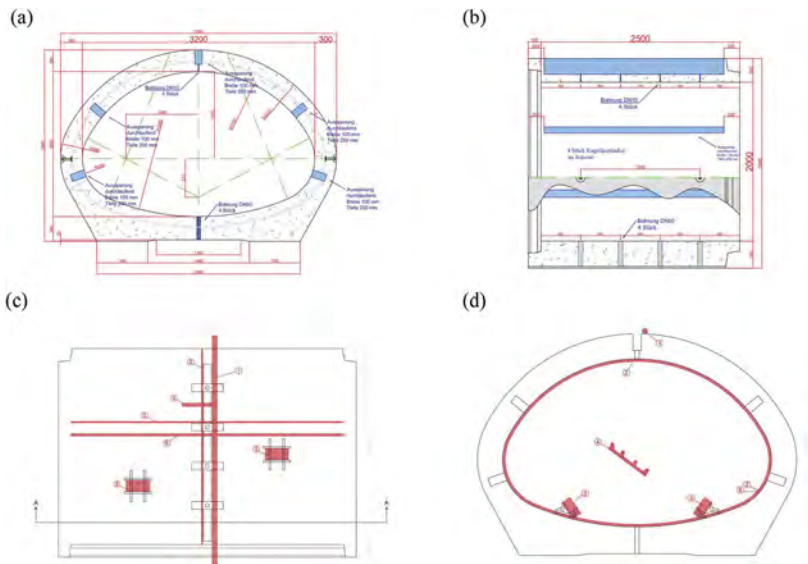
Modified HABA mouth profile and the location of the monitoring systems (a) mouth profile cross-section, (b) reinforcement plan, (c) profile floor plan with measuring system arrangement and (d) mouth profile cross-section with measuring system arrangement. Monitoring systems: (1) Longitudinal inclinometer by HBK, (2) Fibre optic sensor system by HBK, (3) Profile laser scanners, (4) Digital Image Correlations System DIC by DANTEC (5) SAA – inclinometer by Measurand. In addition, a laser tracker and a total station were operated, which were located outside the profile.
